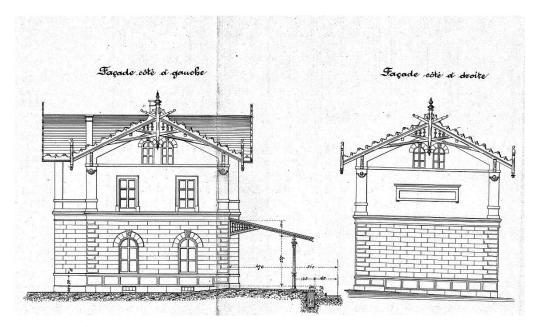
Ist class station building project drawn for Konya / Elevations
